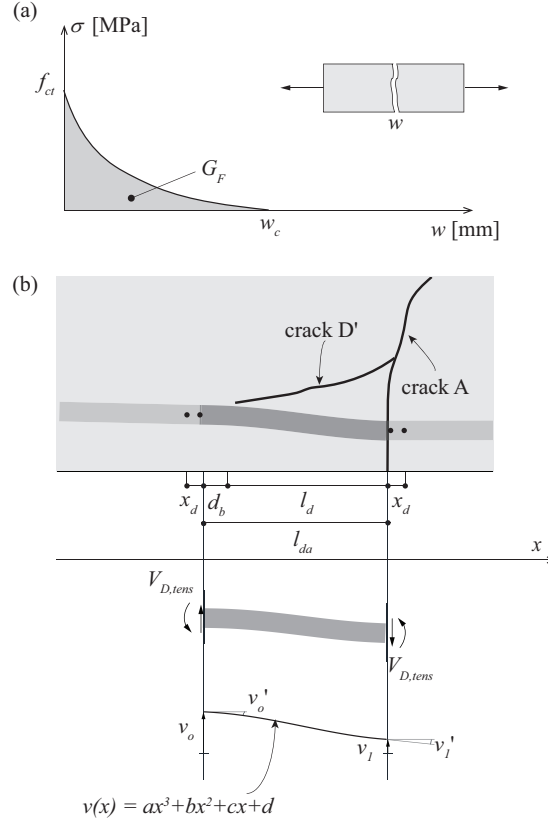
(a) Tension softening of concrete under pure tensile stresses; (b) dowelling action: deflection of the flexural reinforcement in the proximity of the dowelling crack (crack type D')
